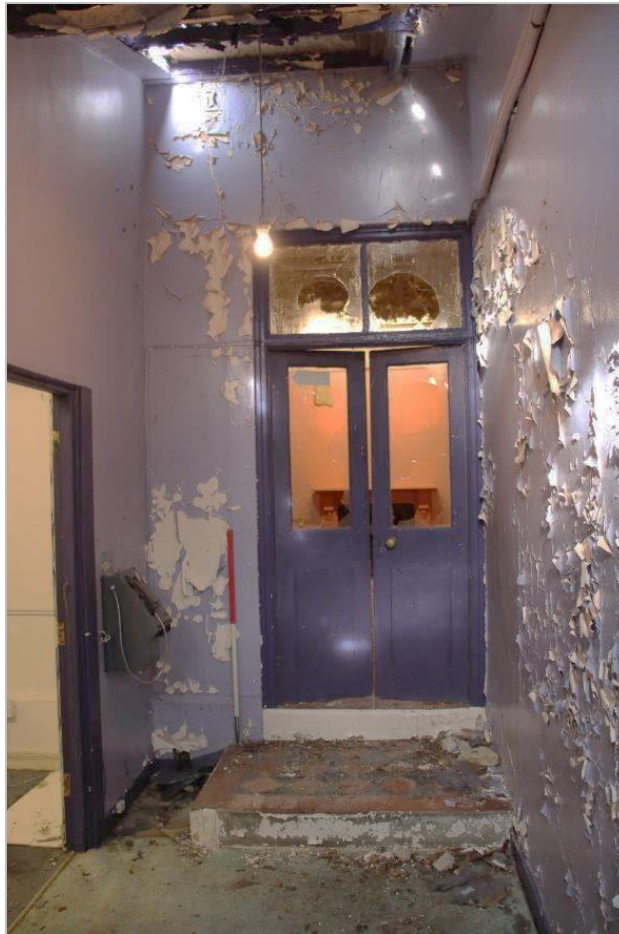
West wall of Common Room, both doors lead to Passageway. There is a blocked fireplace in south wall on left, hearth can be seen. Timber floor boards.
